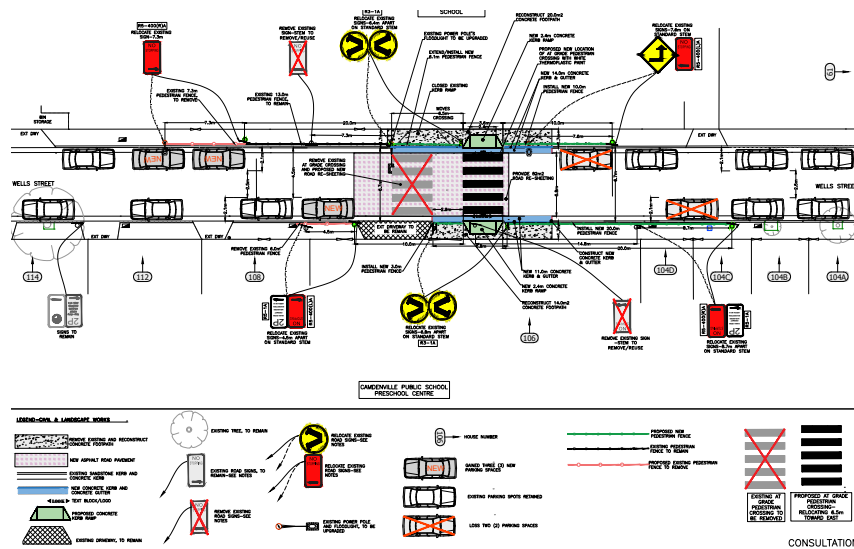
Wells Street between Edgware Road and Commodore Street
